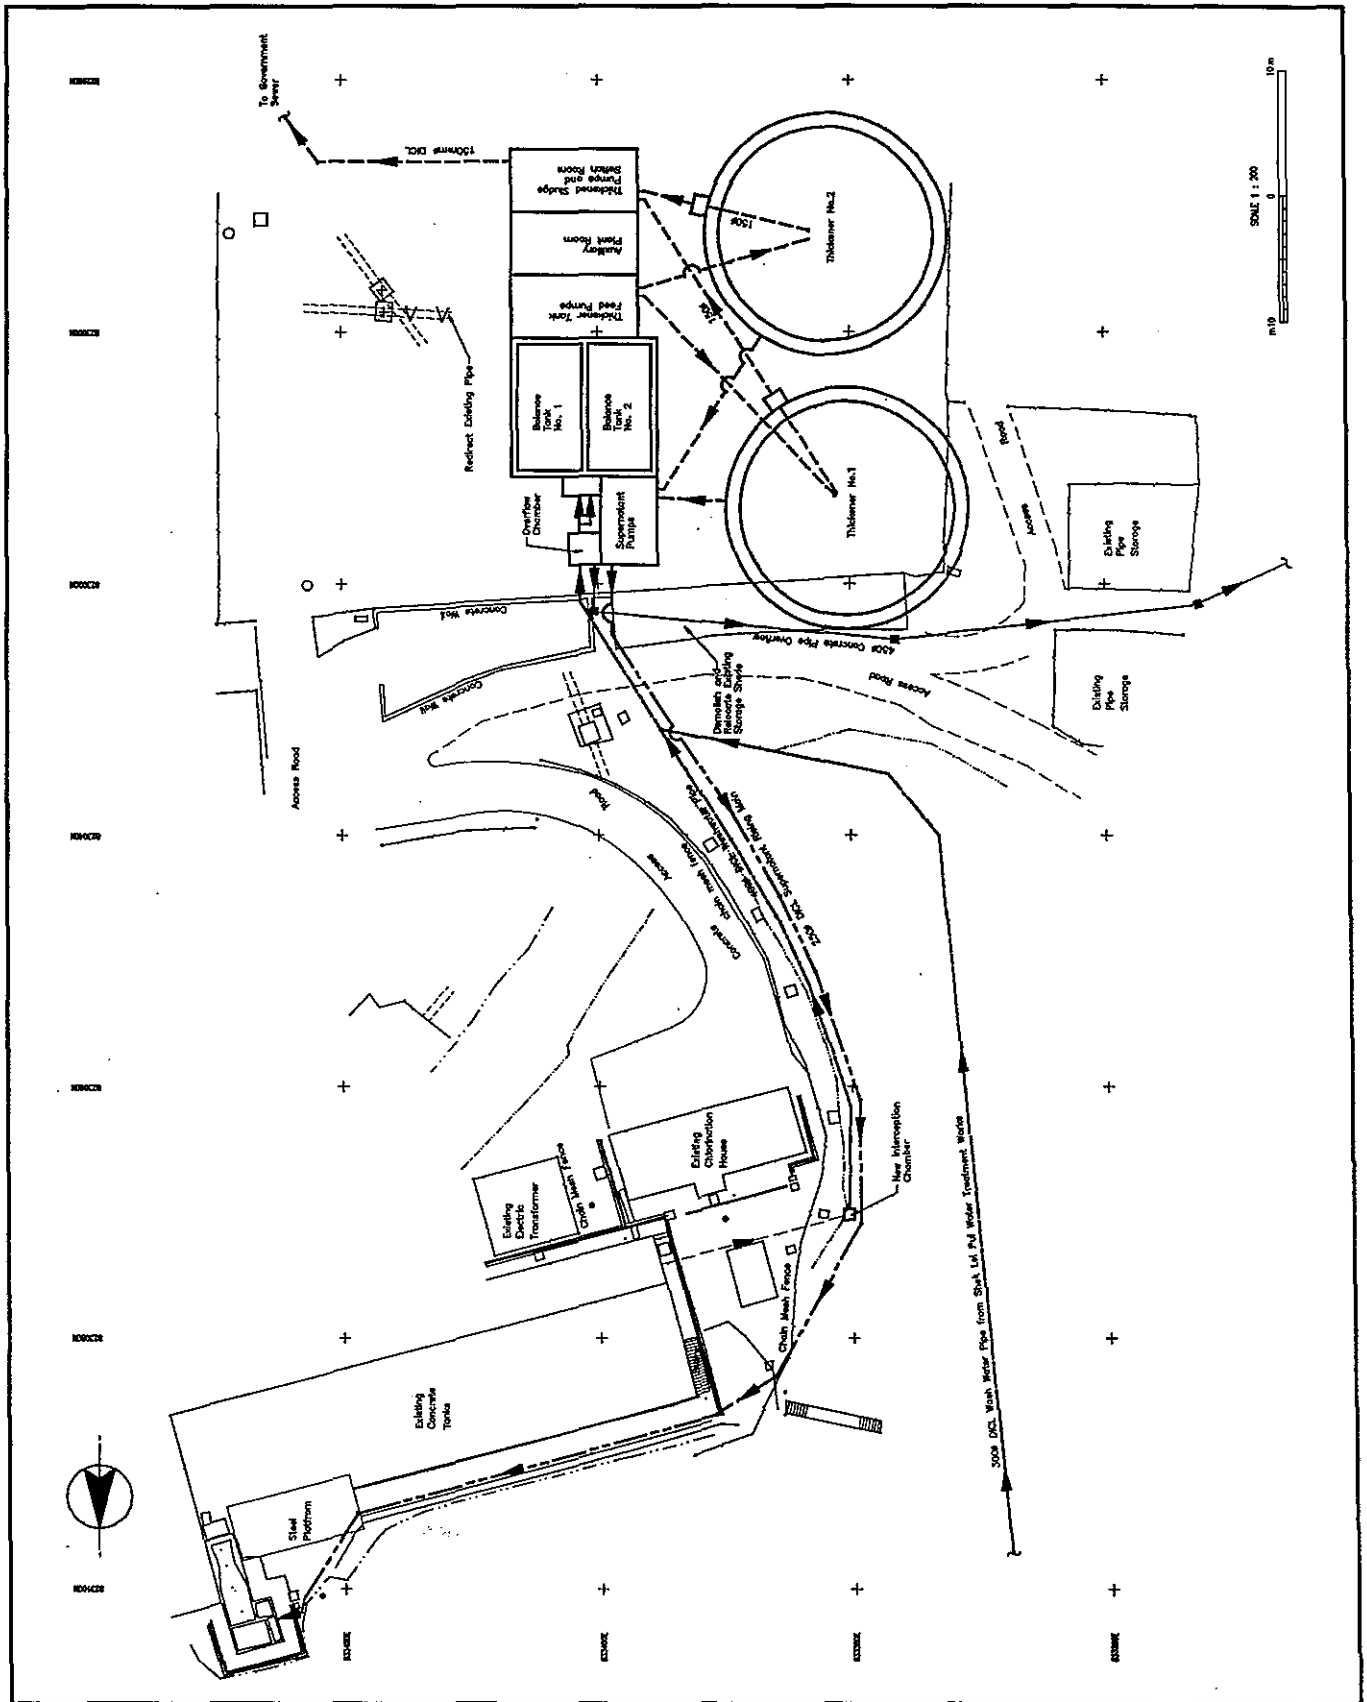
Layout of Proposed Sludge Treatment Facilities at Tai Po Road WTW
